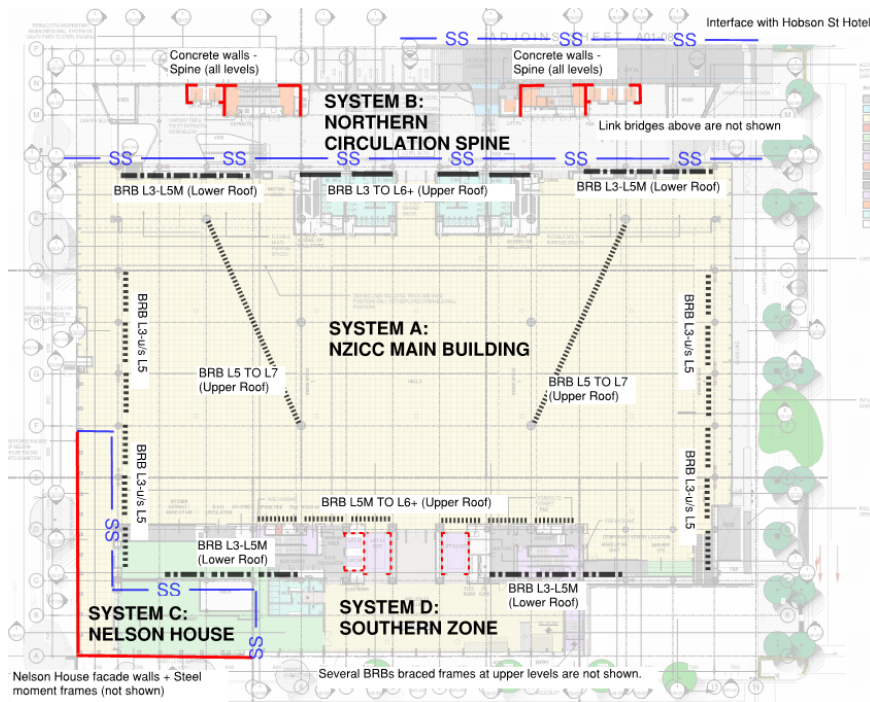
Schematic plan of NZICC Main Site – illustrating the four seismic resisting systems and movement joint detailing requirements
